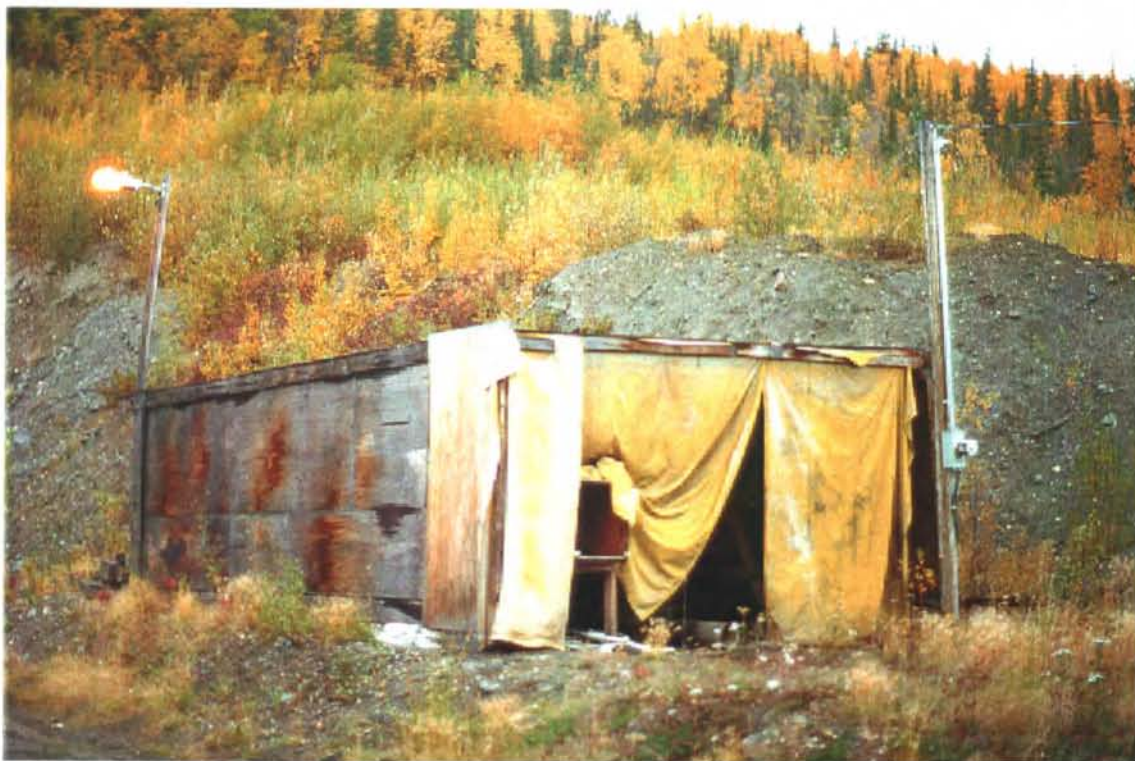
Building 12A - a storage building currently in use. (Azimuth 320°)
